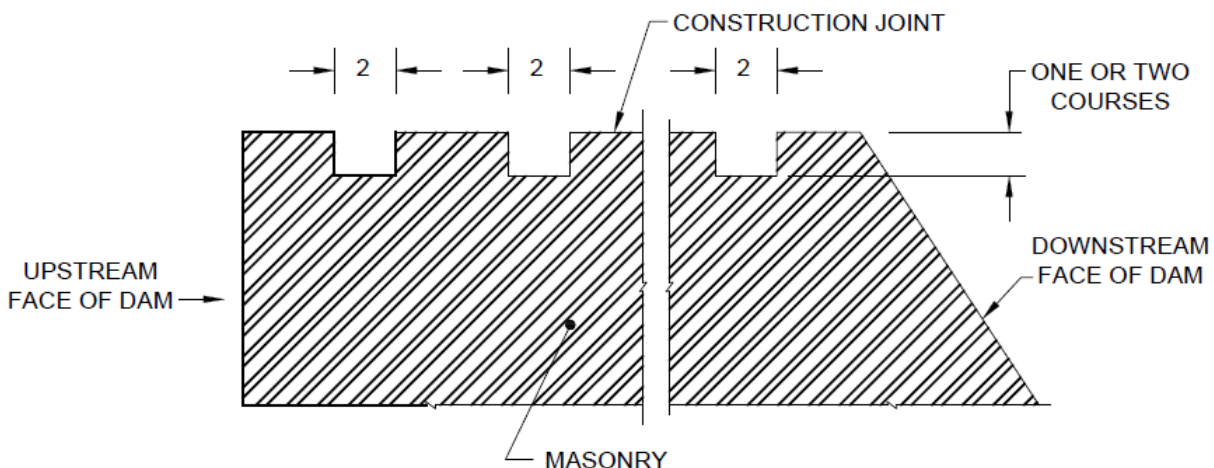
DETAILS OF CONSTRUCTION JOINT
